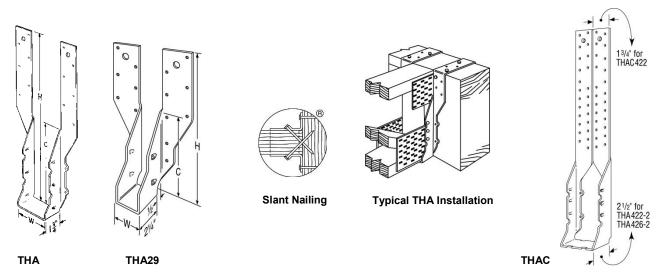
THA SERIES TRUSS HANGERS ADJUSTABLE
